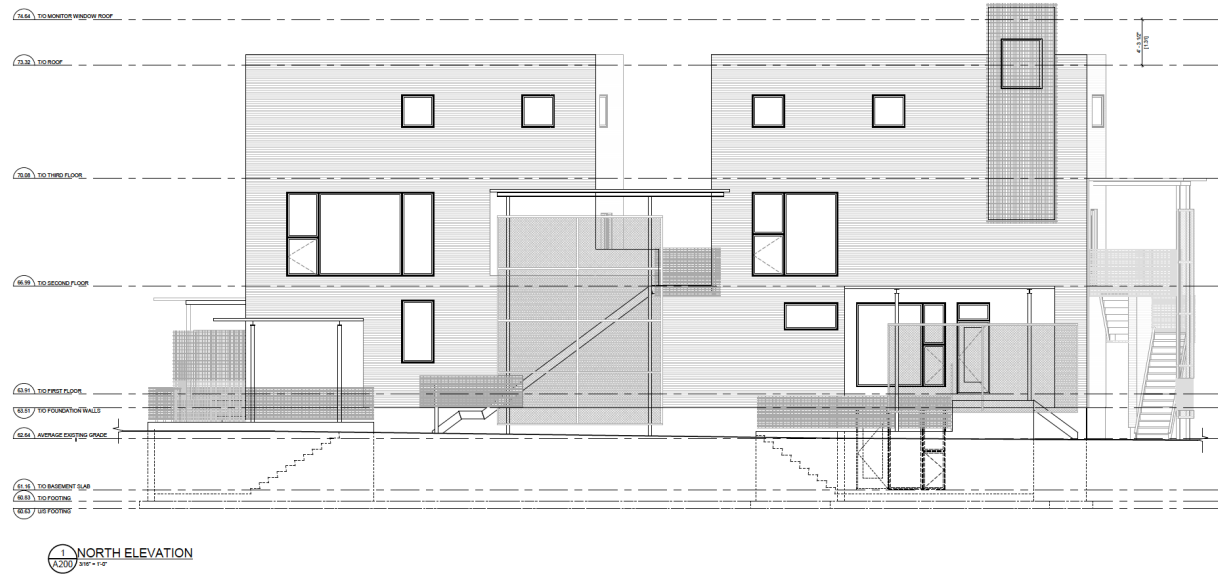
North Elevation (Source: Colizza Bruni Architecture)
